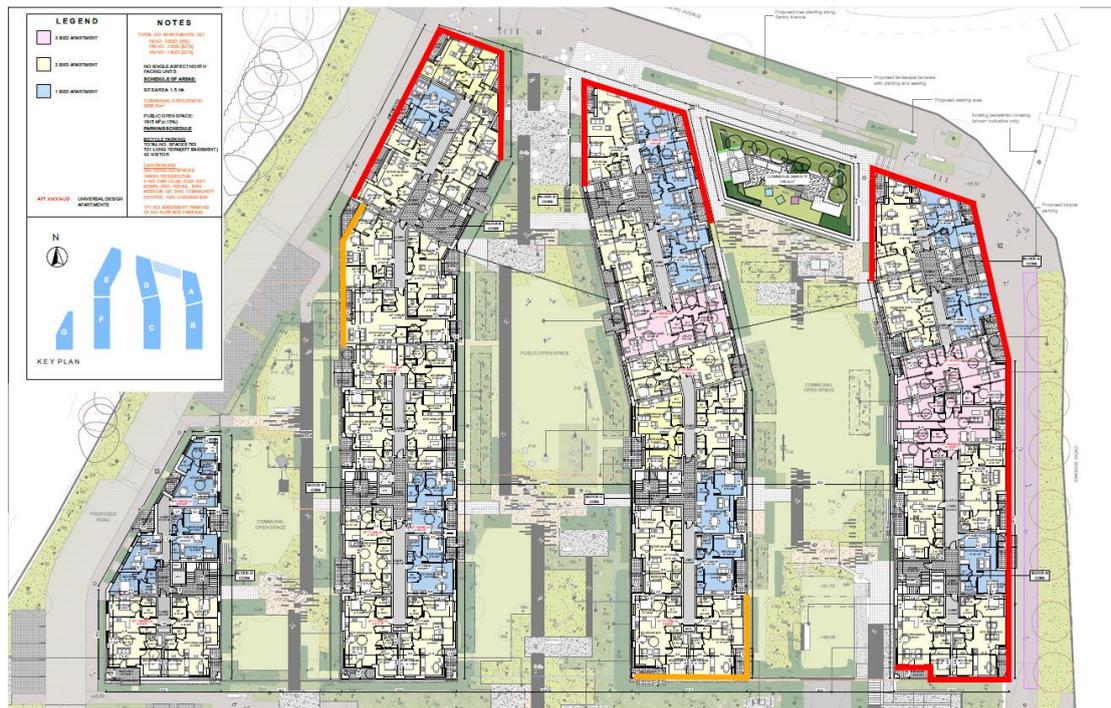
Façade Acoustic Requirements – First Floor to Seventh Floor
